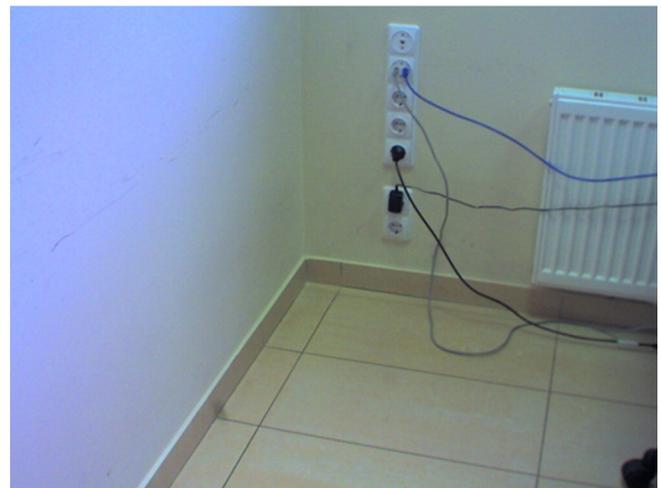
Typical air leakage places in the studied houses. Junction of the ceiling and floor with the external wall and penetrations of electrical and plumbing installations through the air barrier systems.
